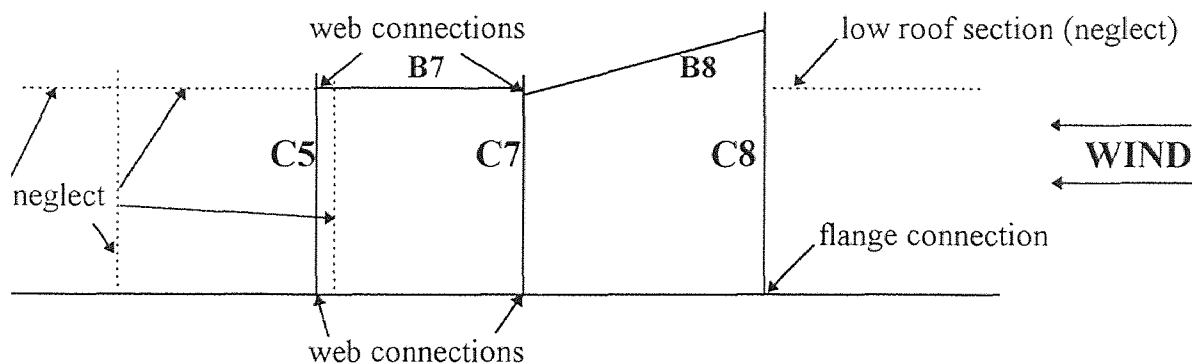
Schematic of Section A-A for Determination of Maximum Moment on Column C8 Due to Wind Loading.
